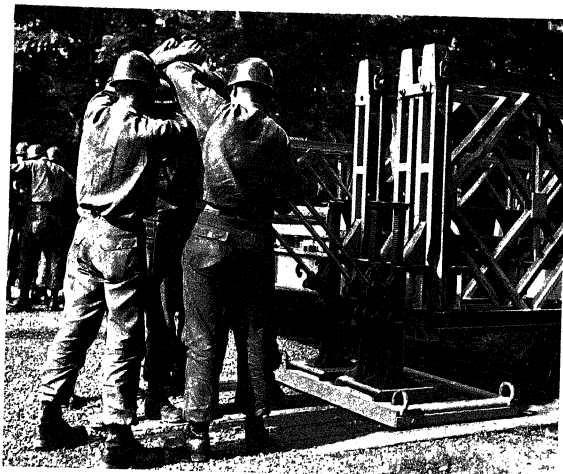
Jacking down after inserting the outer truss and shifting bearings.
